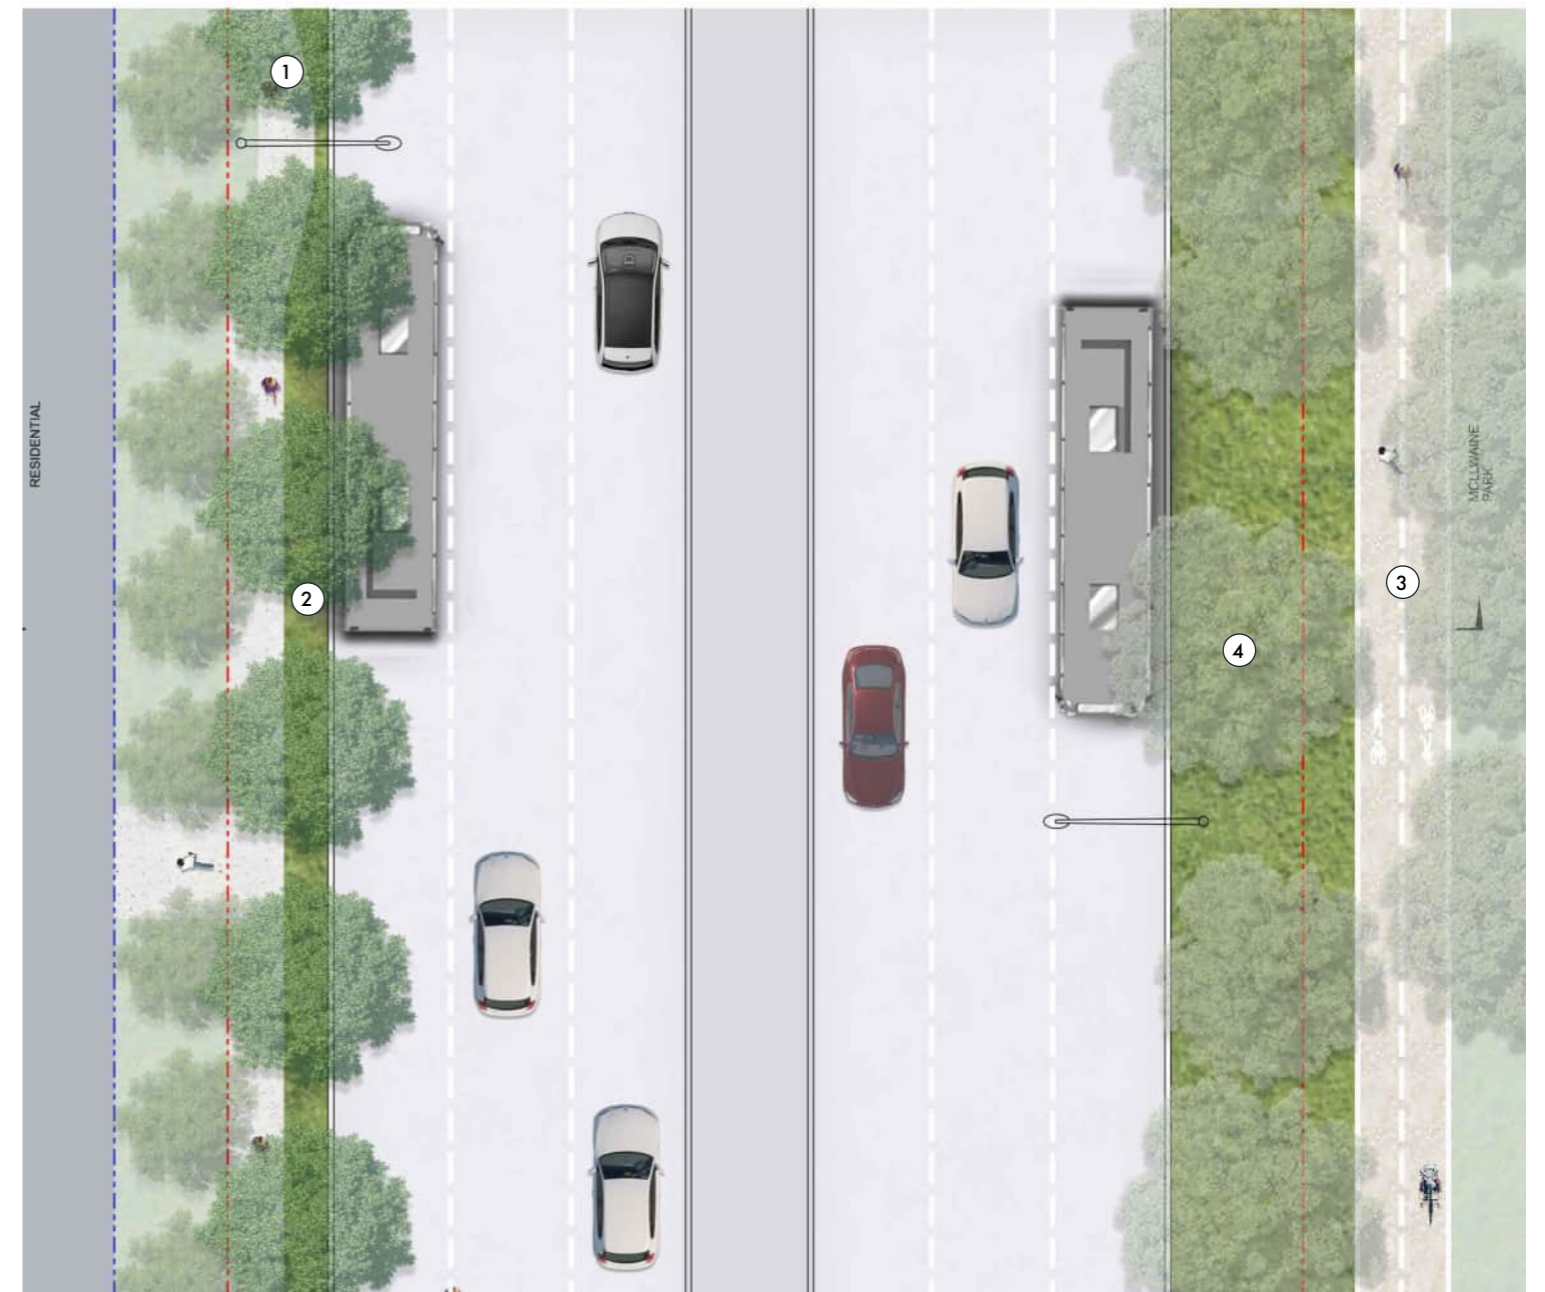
Concord Road South (Mcllwaine Park) - Typical Plan
